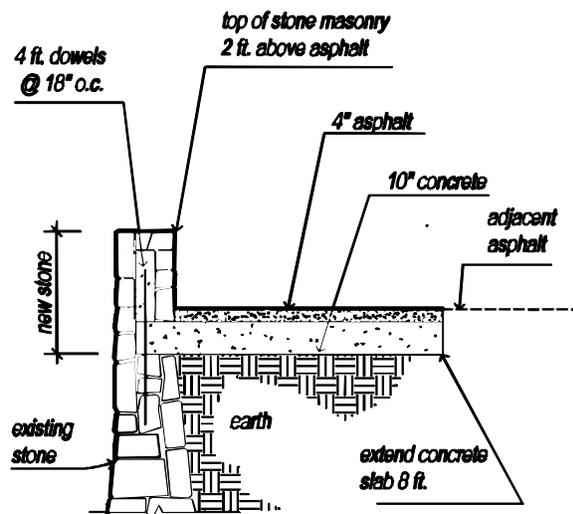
Installation of avalanche-resistant guardwall on existing stone guardwall
